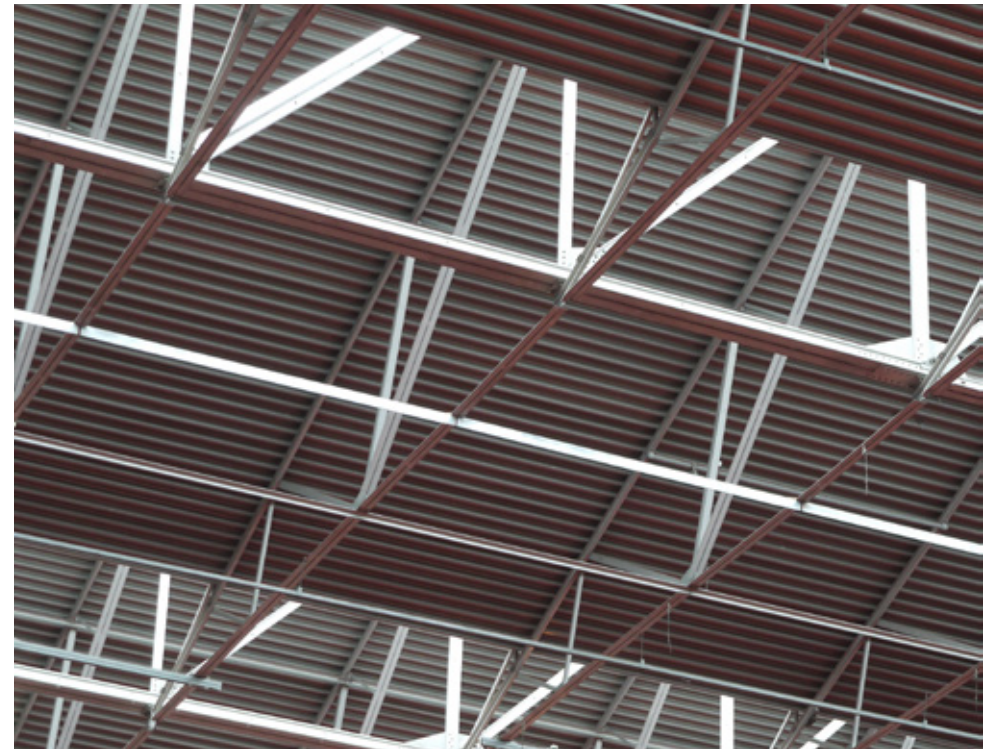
The Comet Flight Test Hangar aluminium structure and aluminium roof deck, photographed in 2016, remain highly reflective and looks like a roof of a contemporary project
